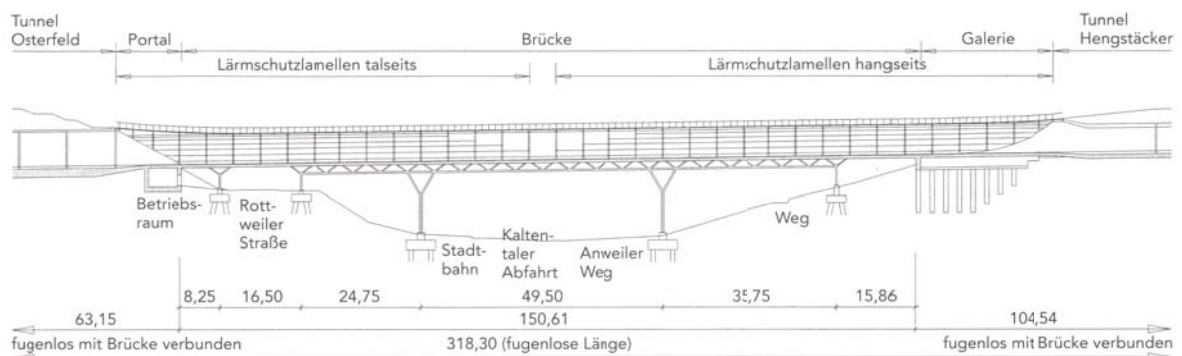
Nesenbachtal-Bridge (with both tunnels) in Stuttgart, Germany
